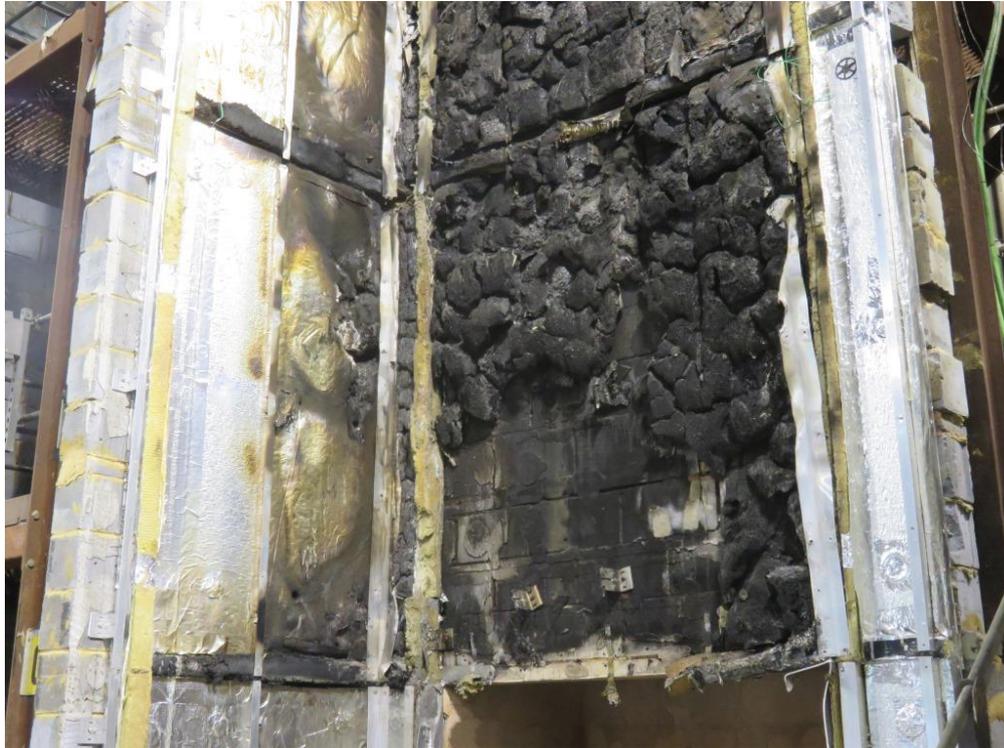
Damage to cladding system beneath ACM panels directly above combustion chamber.
